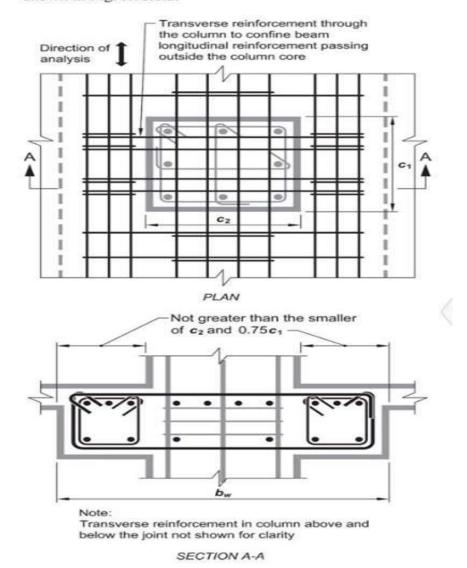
Maximum effective width of wide beam and required transverse reinforcement.
